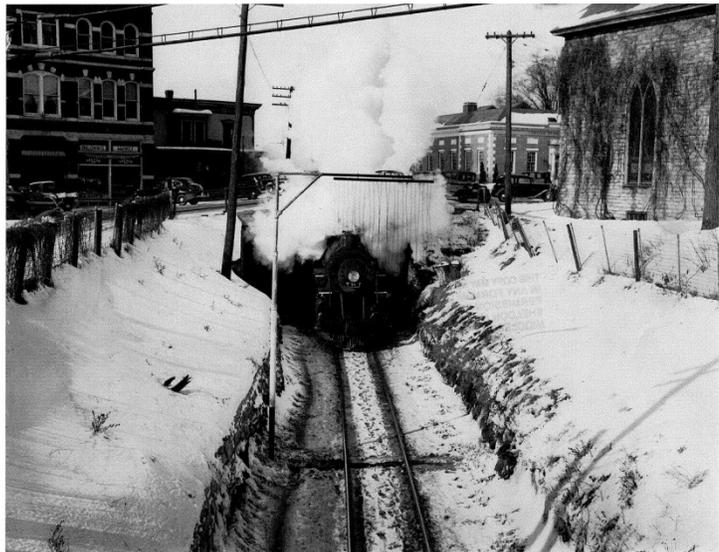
Photo from Merchants Row Bridge looking north at southbound train passing under the Main Street Bridge in 1939. St. Stephens Episcopal Church is visible at top right. The rubble retaining walls between the bridges are also visible.
